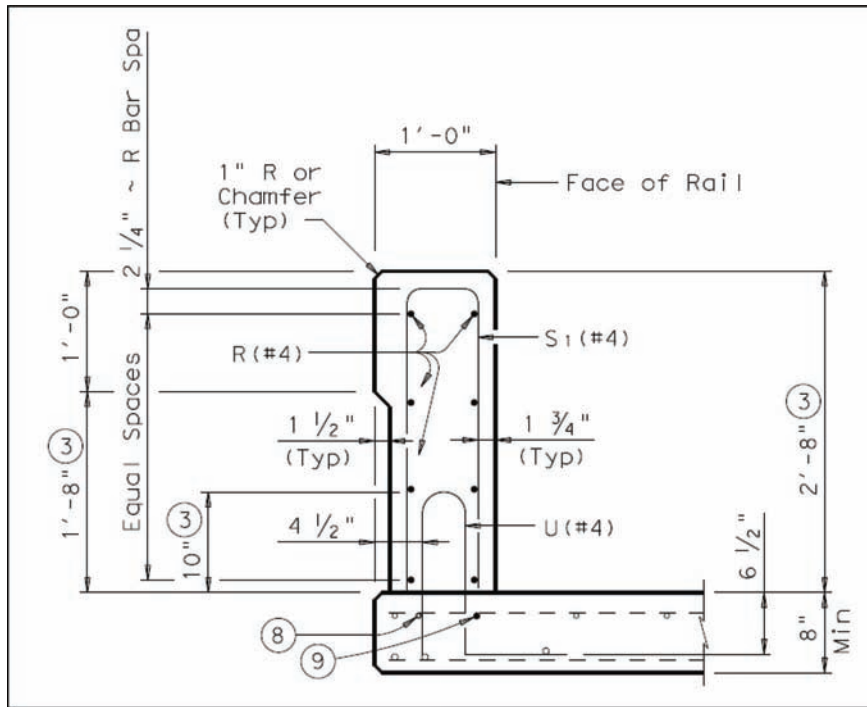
T221 bridge railing detail (TxDOT 2015).
